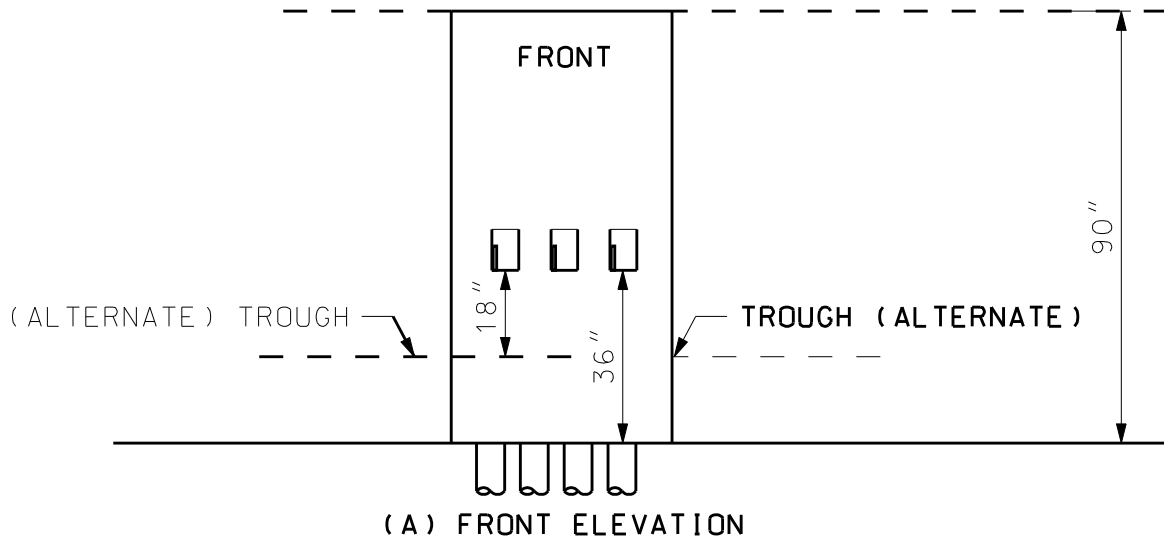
CONDUIT ENTERING BOTTOM OR TROUGHS ENTERING SIDES OF COMPARTMENT.
